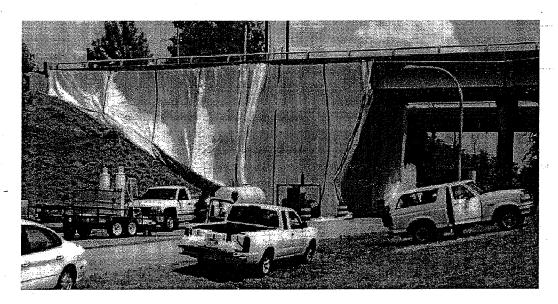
Highway Bridge Rigged for Full Containment of Wastewater from Pressure Washing
